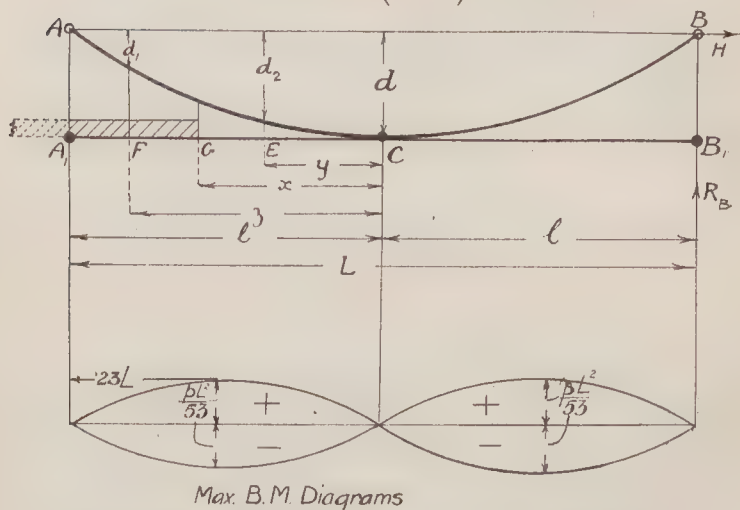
Hinged Stiffening Girders with Uniform Rolling Load.
